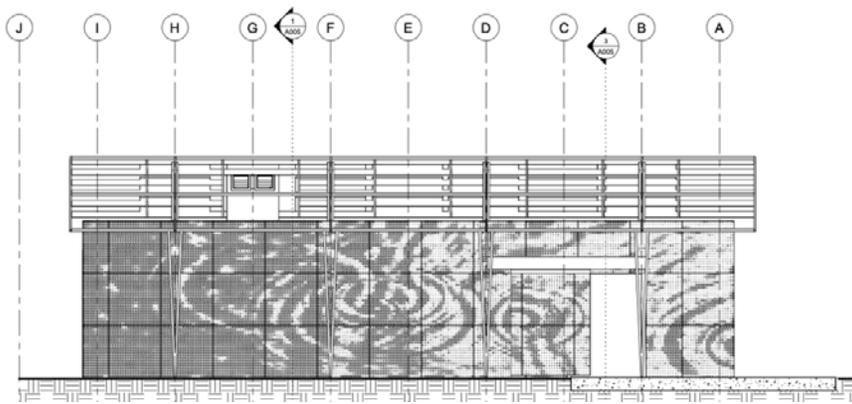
North Elevation: KSU Mini Pavilion (Michael Carroll 2022)
